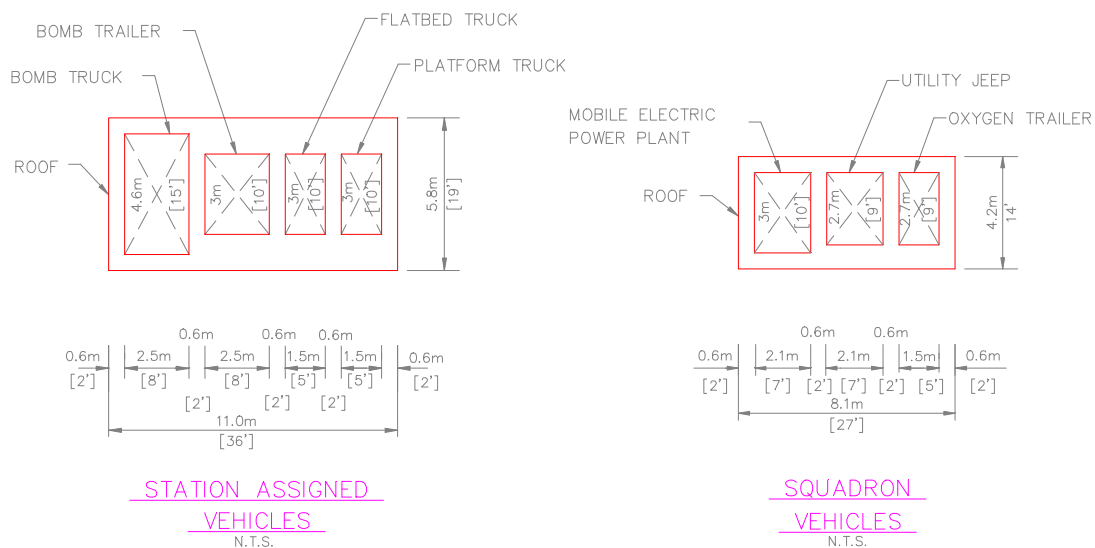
Typical Sight Plan - Vehicle Parking.
